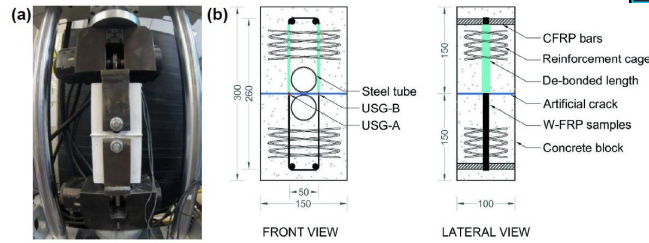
Test setup of FRP reinforcement specimens (a) and design configurations (b) [7]
